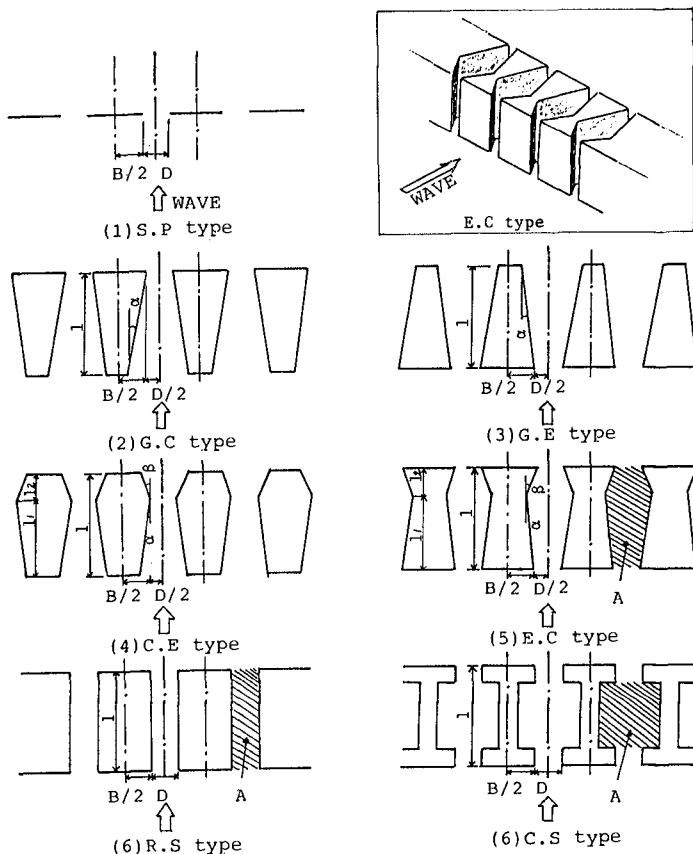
Horizontal cross sections of vertical slit-type breakwaters
